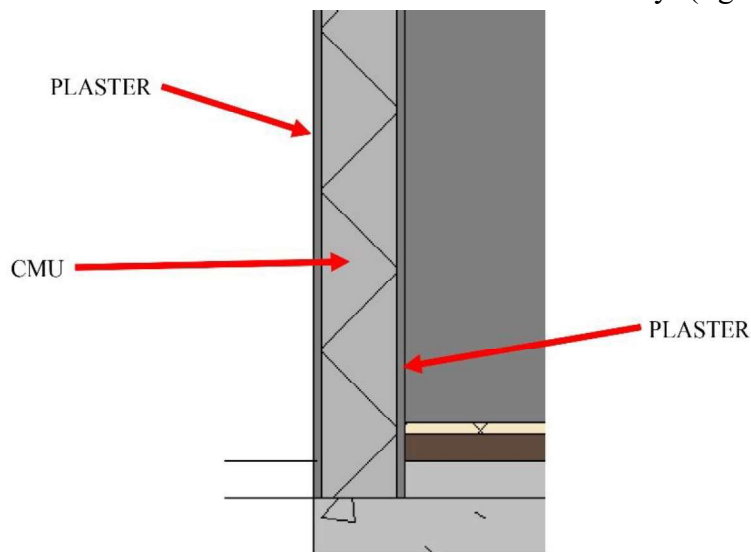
Wall section showing construction materials. Source: Revit Autodesk 2020 by Author
